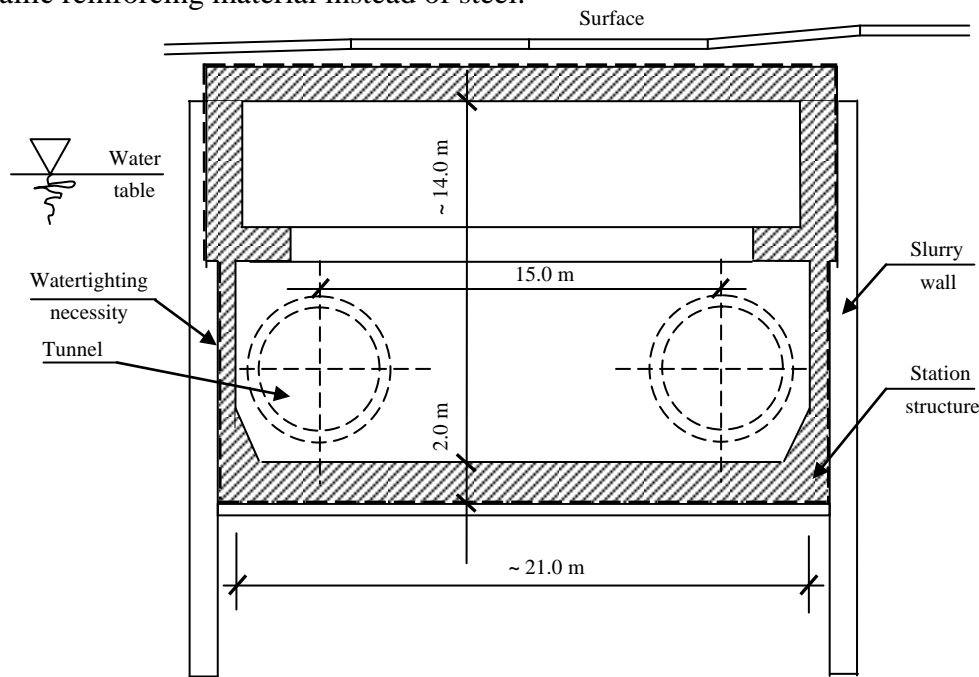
Sketch of a station structure at the 4<sup>th</sup> metro line in Budapest
